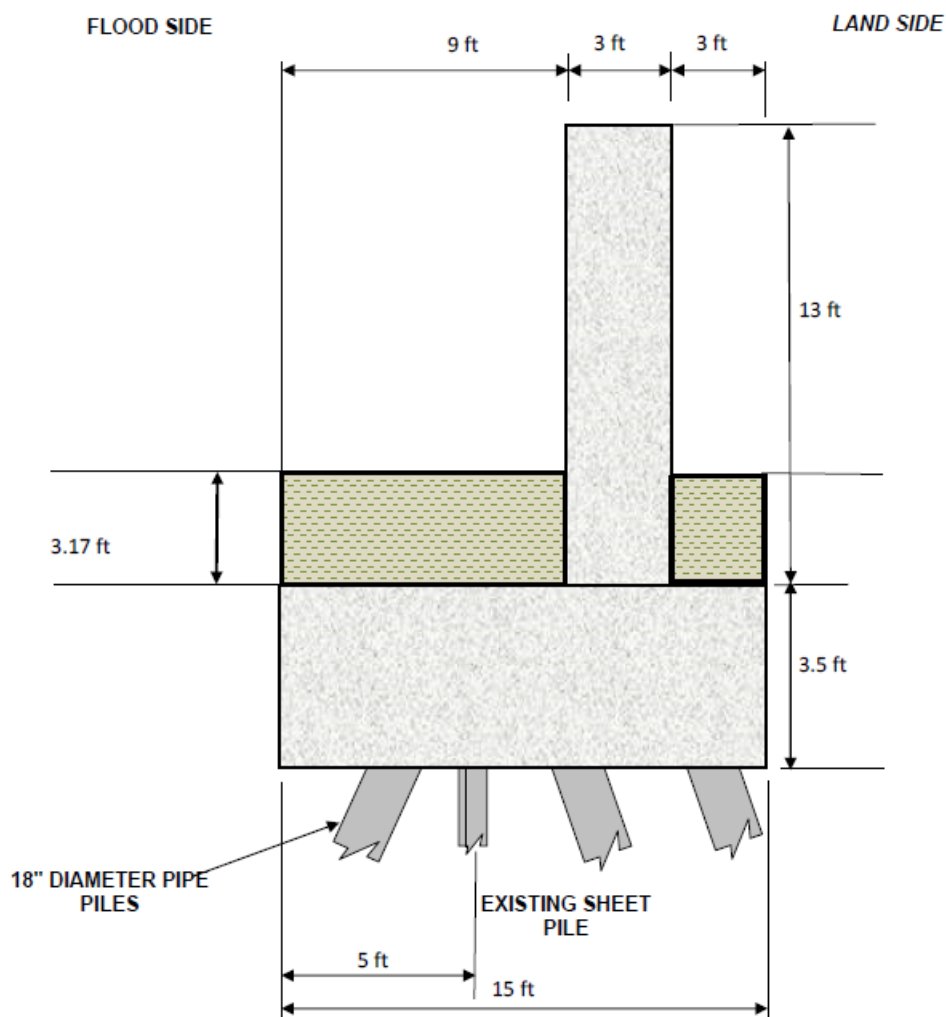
Representative Typical Replacement T-Wall Cross Section
